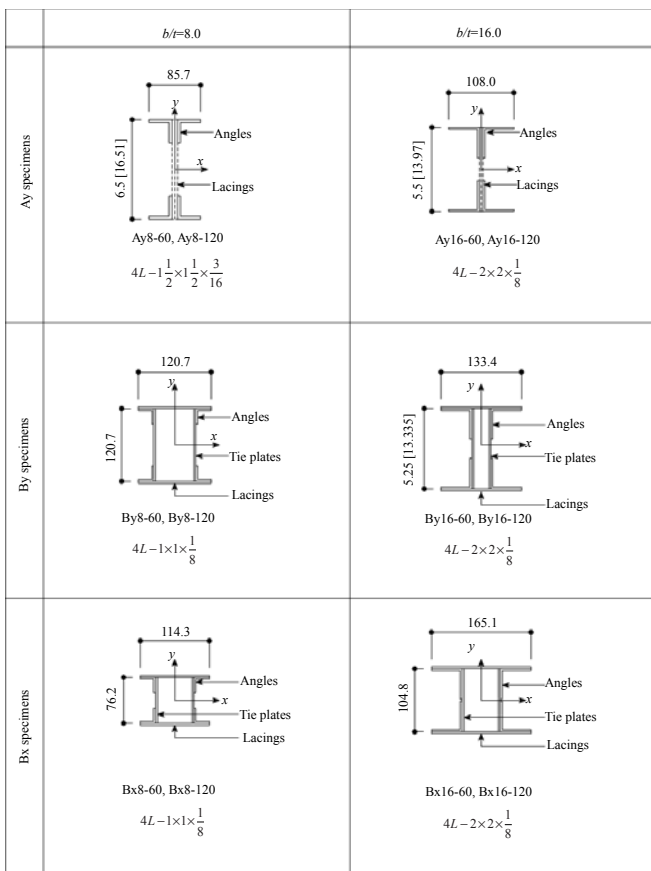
Cross section shapes of the specimens (Length unit: mm)
